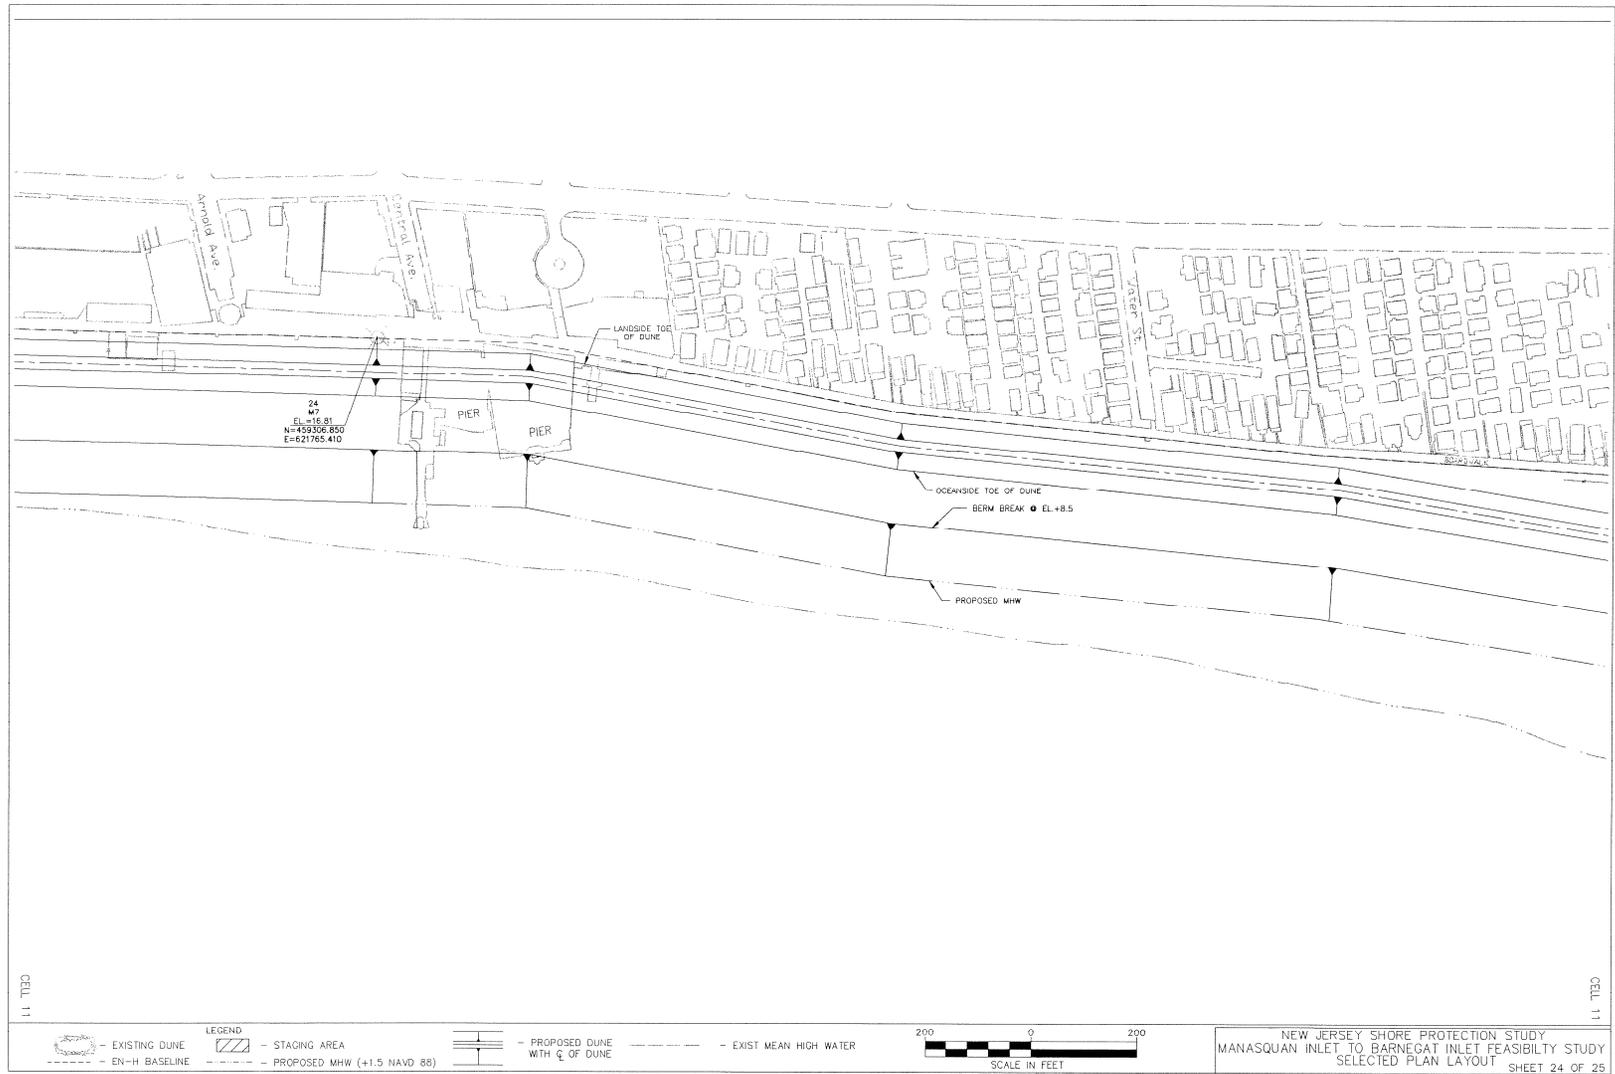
Selected Plan Layout – Point Pleasant Beach Borough, Arnold Avenue to North of Water Street
